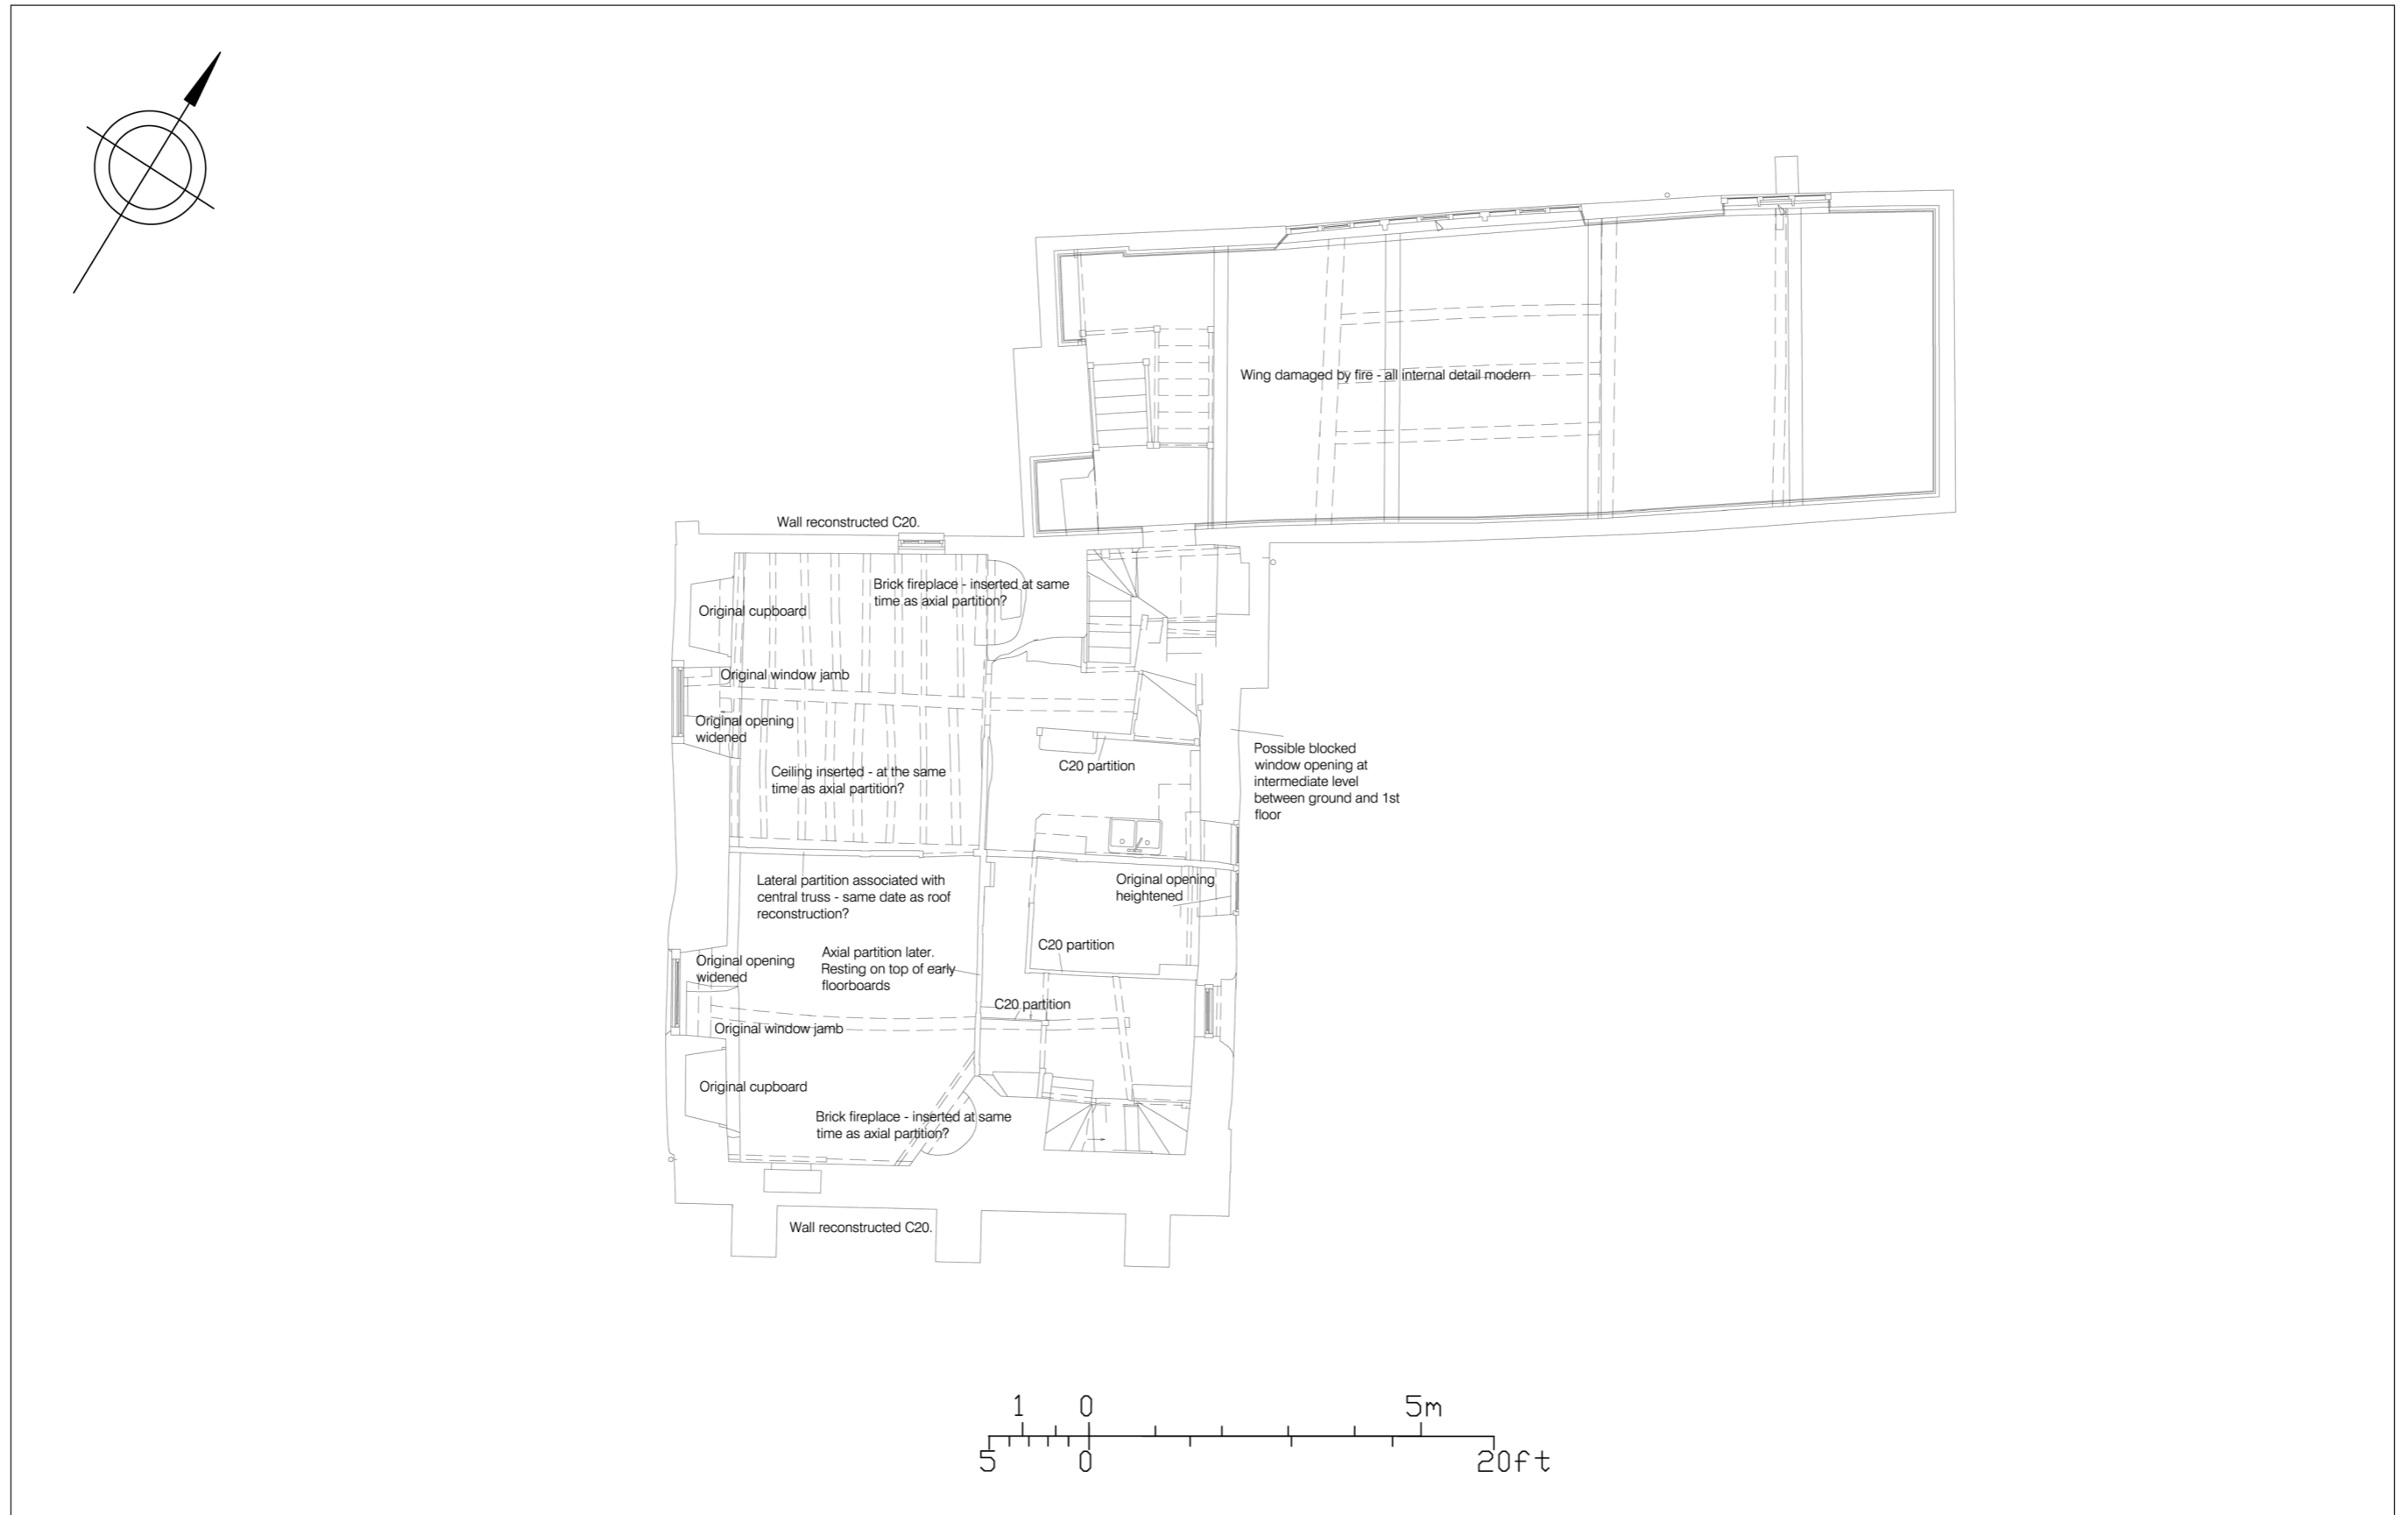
First-floor plan. Scale 1:100. [Based on survey drawings from Acanthus Clews Architects © Coventry City Council]
